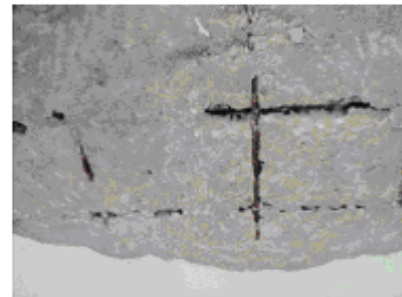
Slab soffits showing a thin concrete cover and corroded rebars
